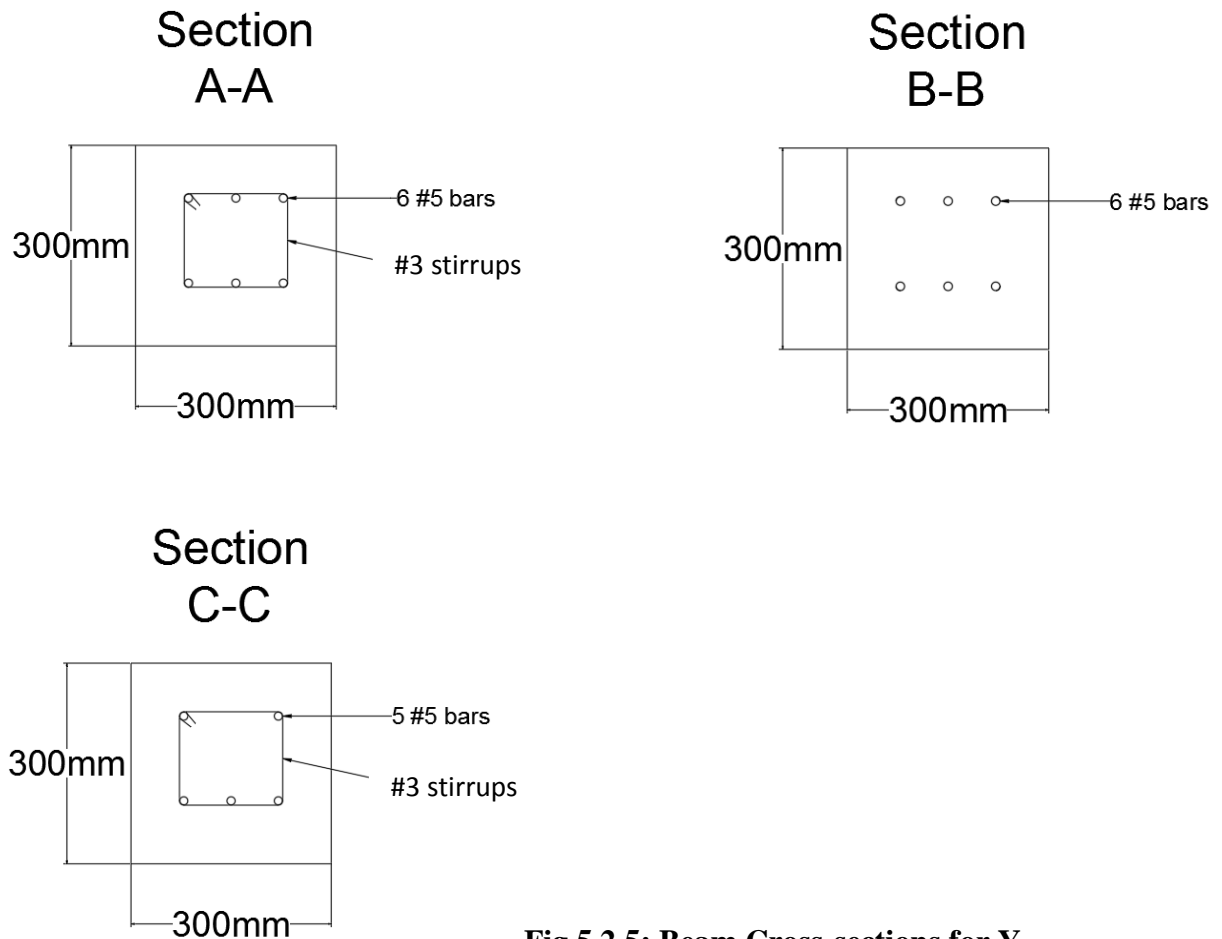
Beam Cross-sections for Y-axis GF-2F
